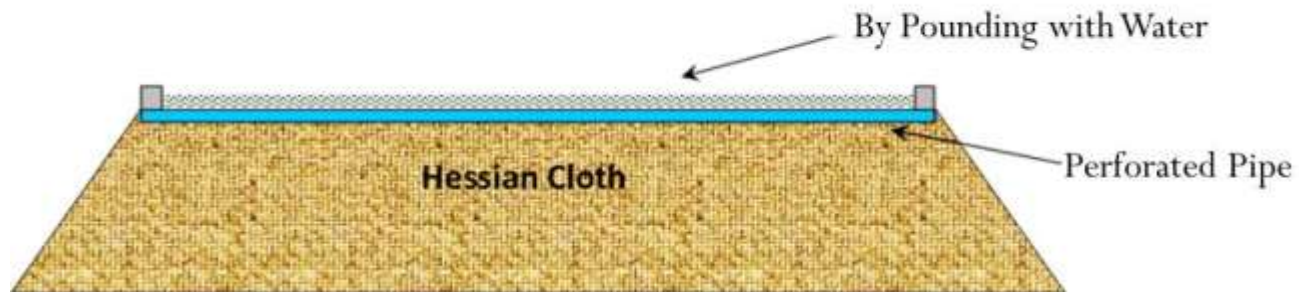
Curing of Trapezoidal Footing, 24 x 7 with water
